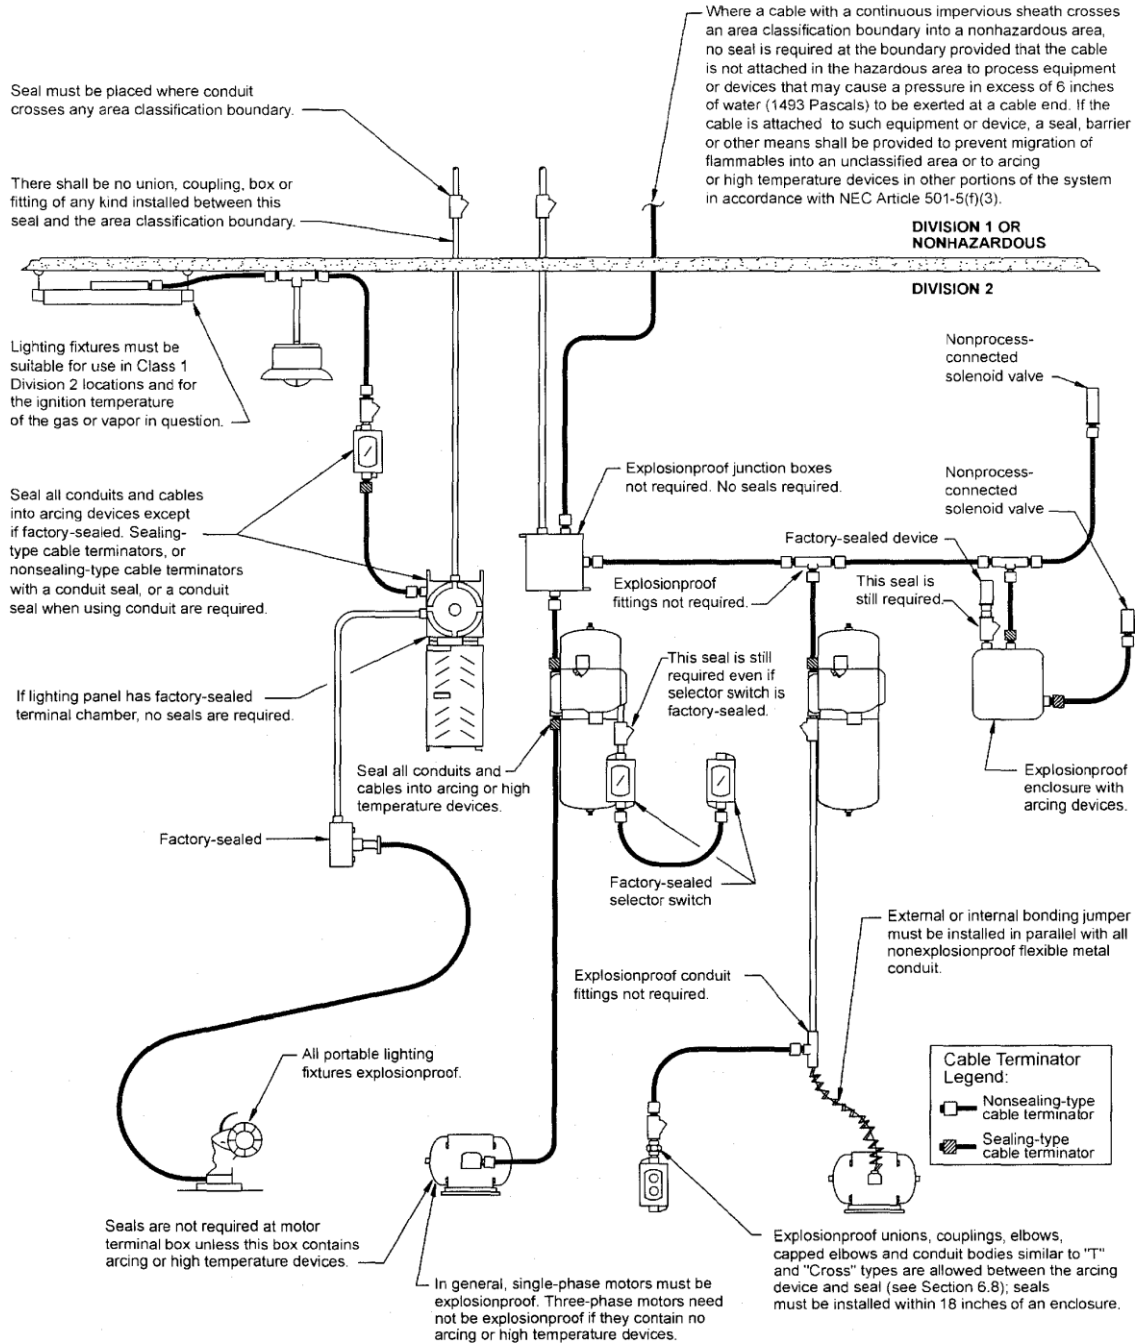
Typical Class 1, Division 2 Electrical Installation Conduit or Cable System
